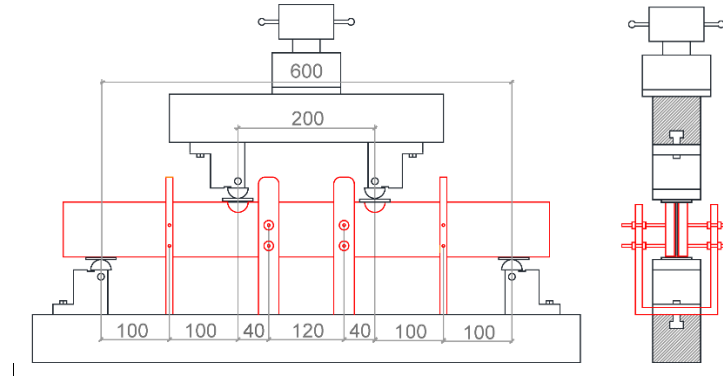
In-plane four-point bending final setup, front (left) and side (right) views, with focus on dimensions and lateral constraint (red)
